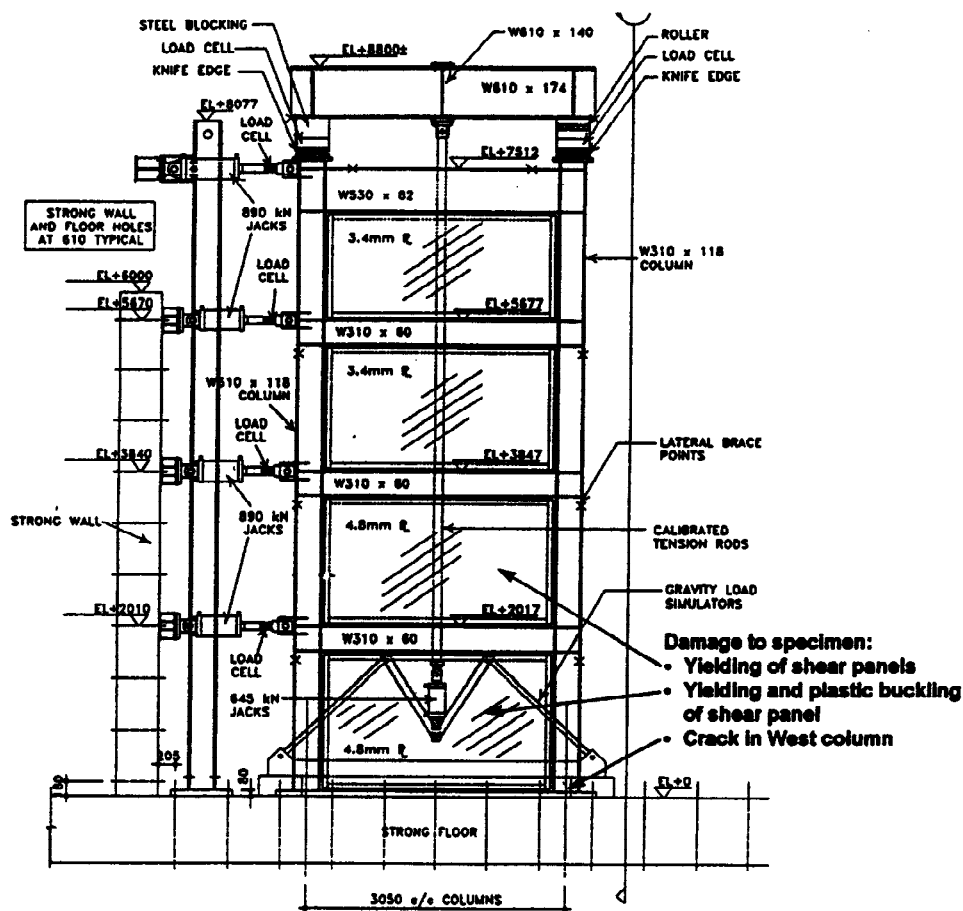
Steel plate shear wall test specimen (Driver *et al.*, 1995)
